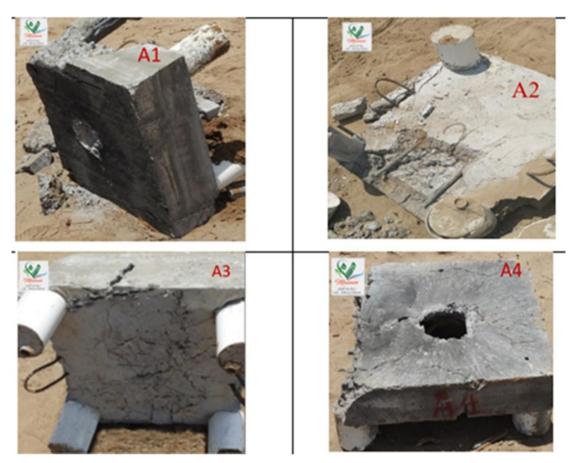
The damage of the concrete samples after being repaired and exposed to a second blast
